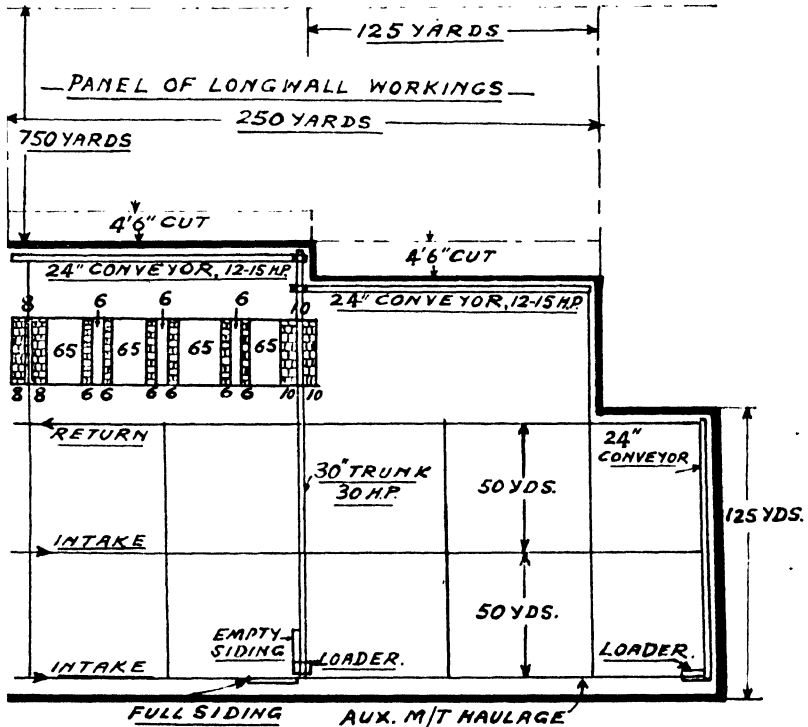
Plan of Longwall Workings for Machine Mining.
